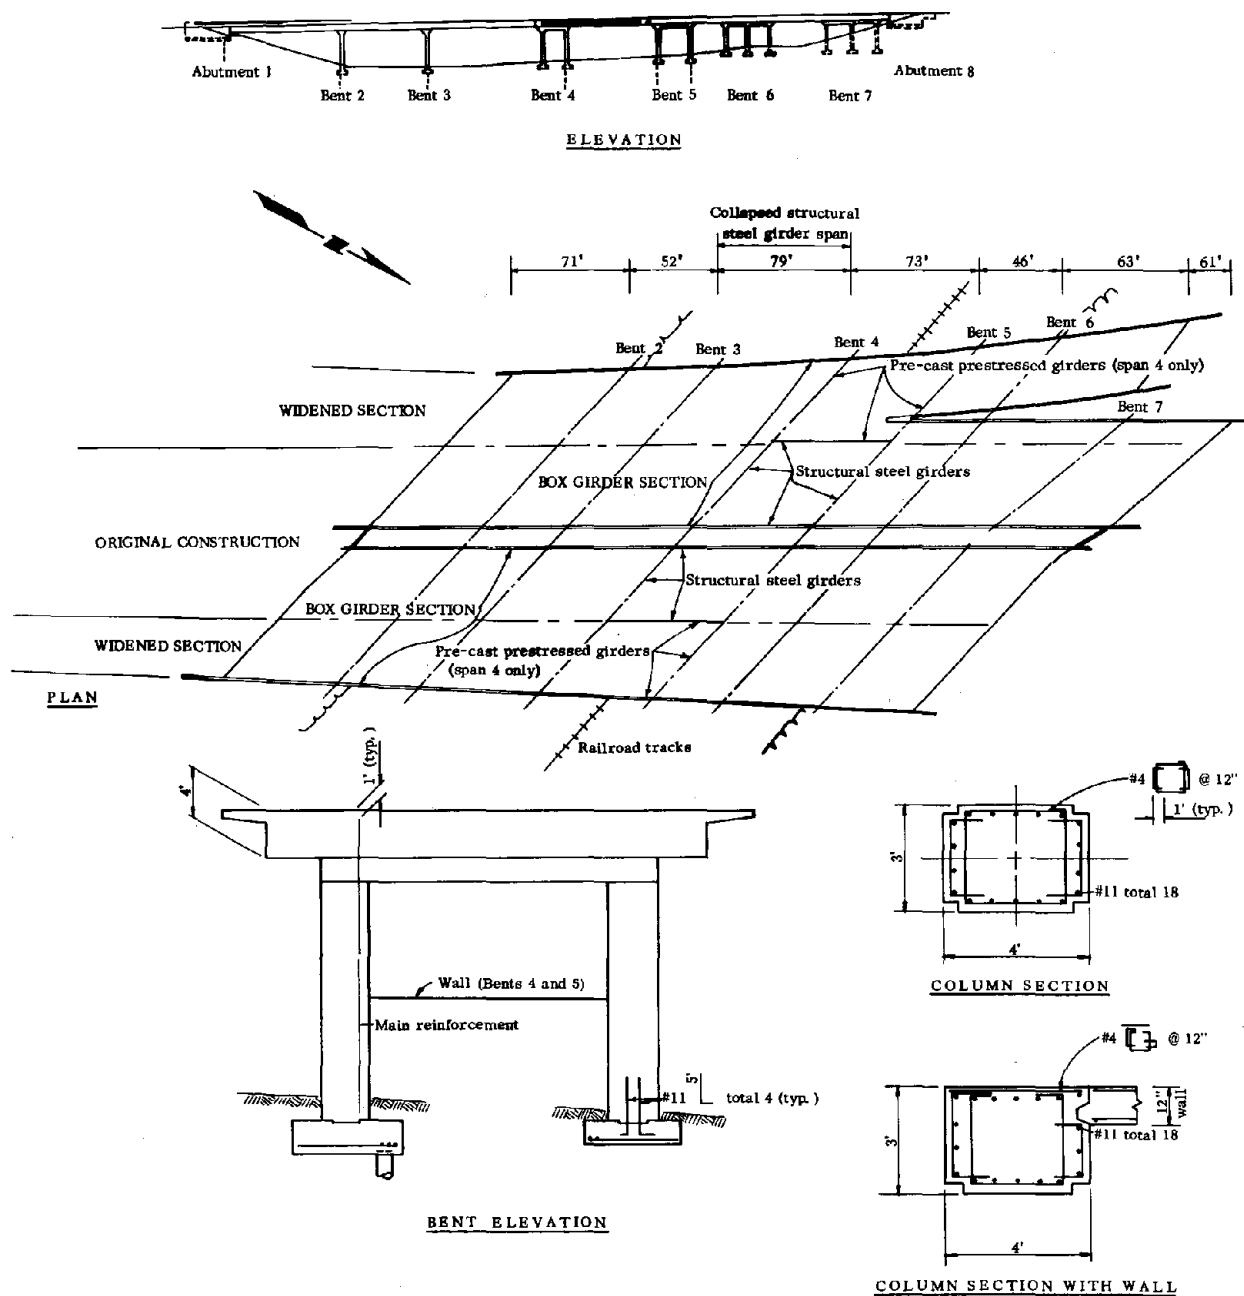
San Fernando Road Overhead (Widen) bridge. Construction details.
